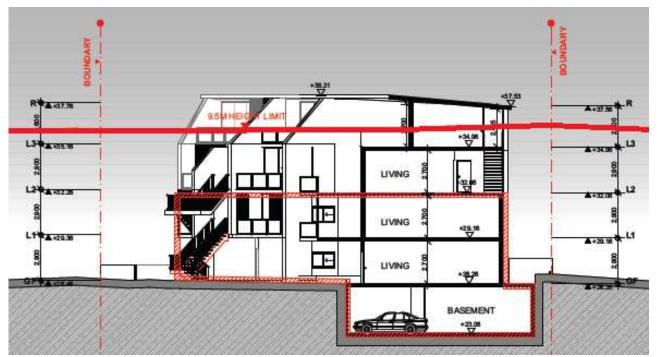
Section view looking south noting the extent of the proposed building height variation.
